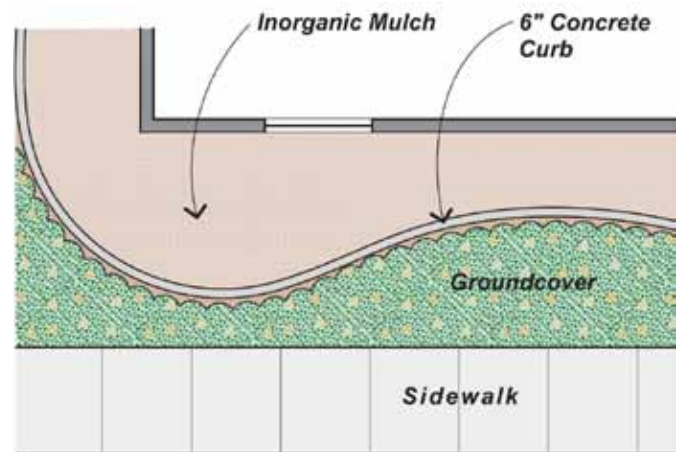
Typical foundation treatment. Note that the inorganic mulch is separated from the planting bed by a concrete curb.
